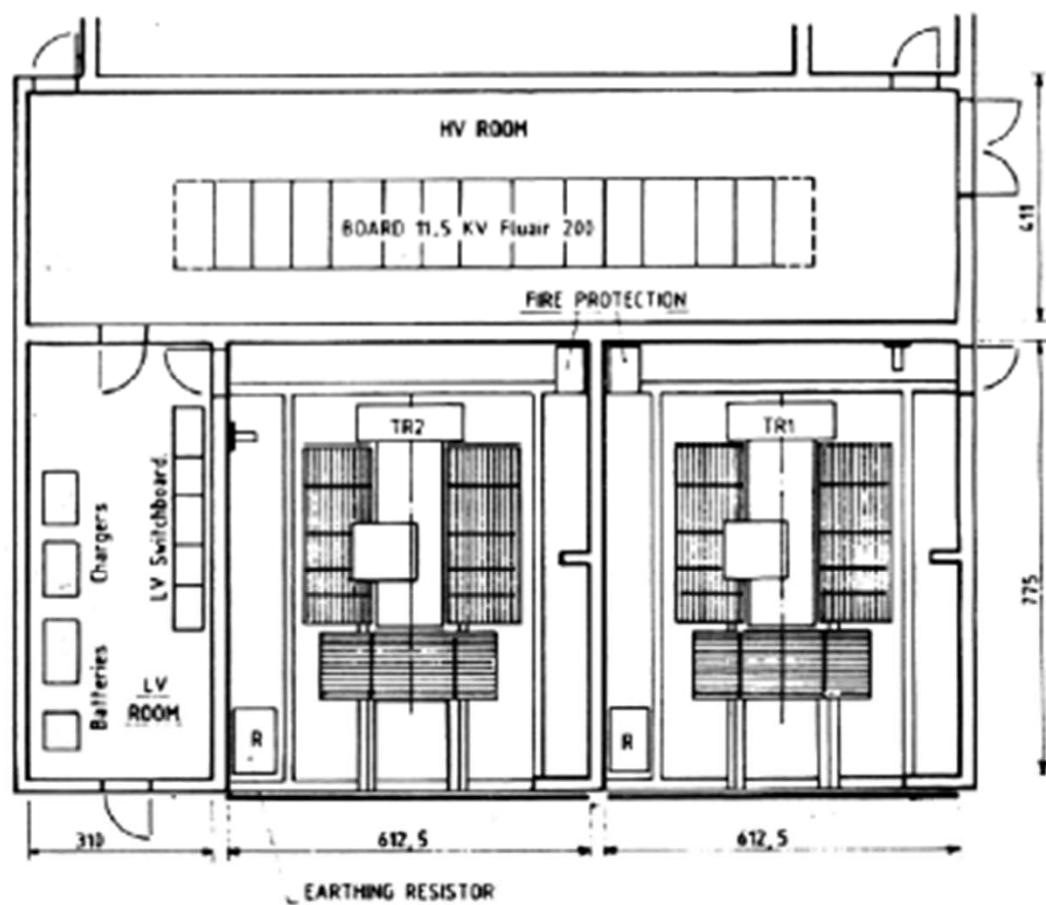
Equipment Layout of a Typical 33/11 kV Substation
